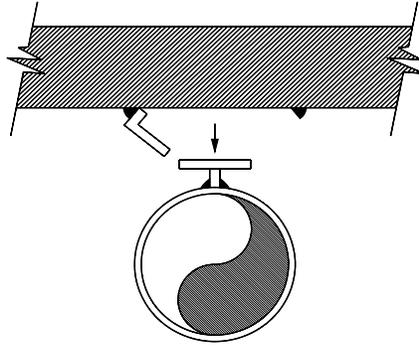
Undersize Angle Weld, May Shear
